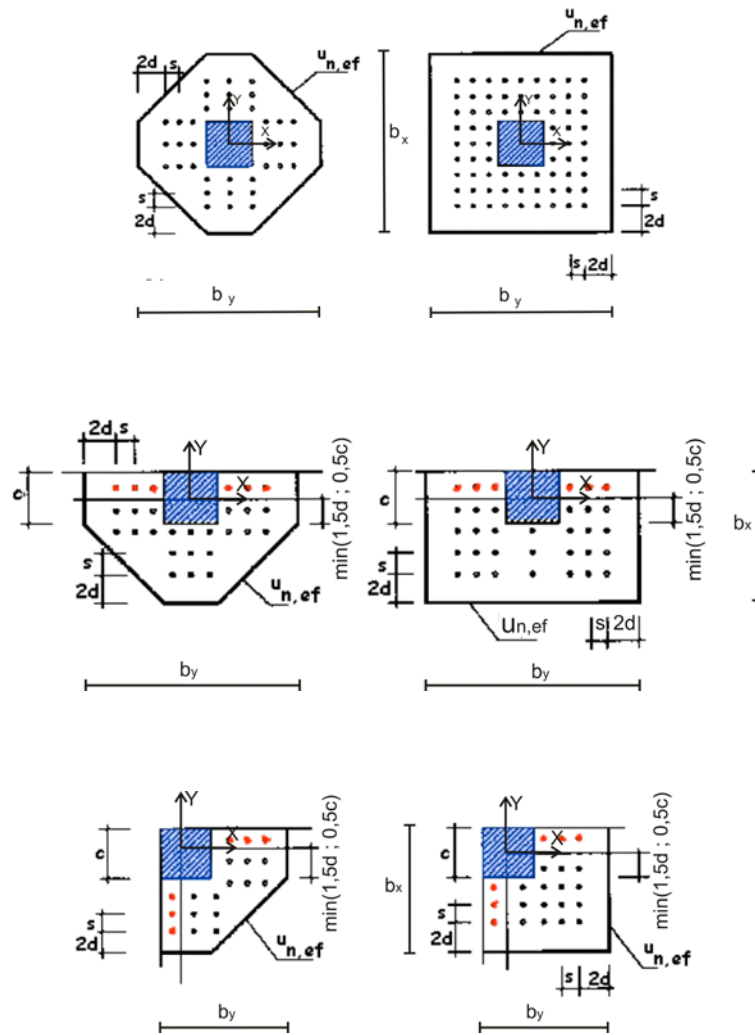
a. Plan view of types of punching shear reinforcement. The darker areas indicate the reinforcement necessary. The lighter areas indicate additional reinforcement.
